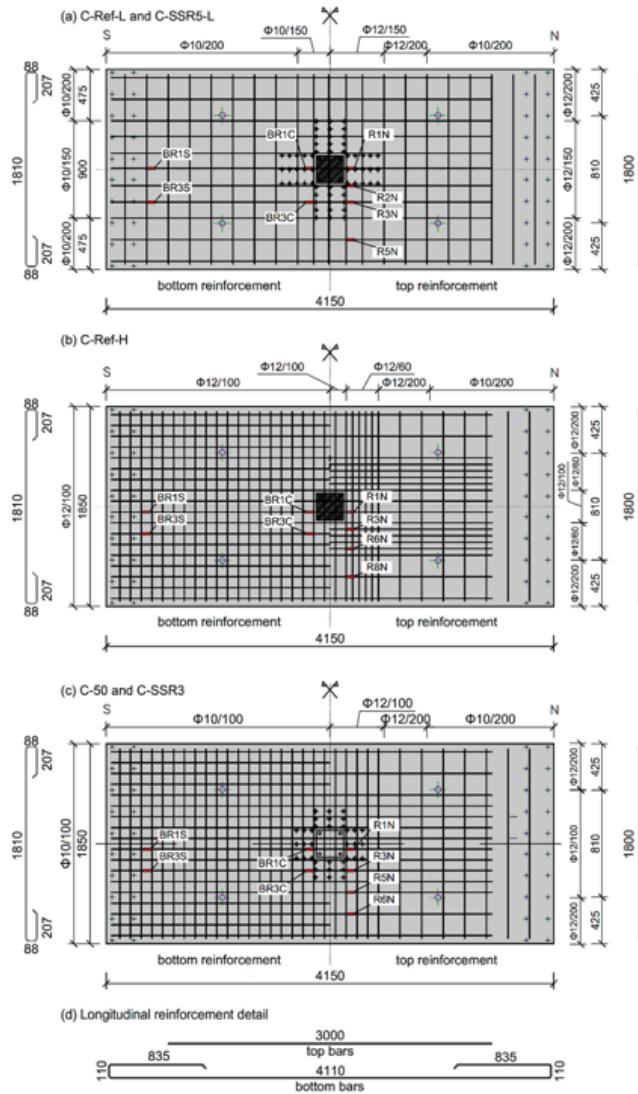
Flexural reinforcement details(Isufi et al., 2021).
